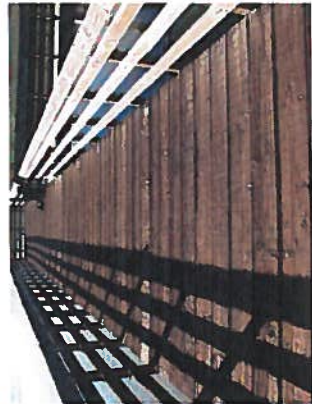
Marina Fishing Pier - Pier Deck Planks
